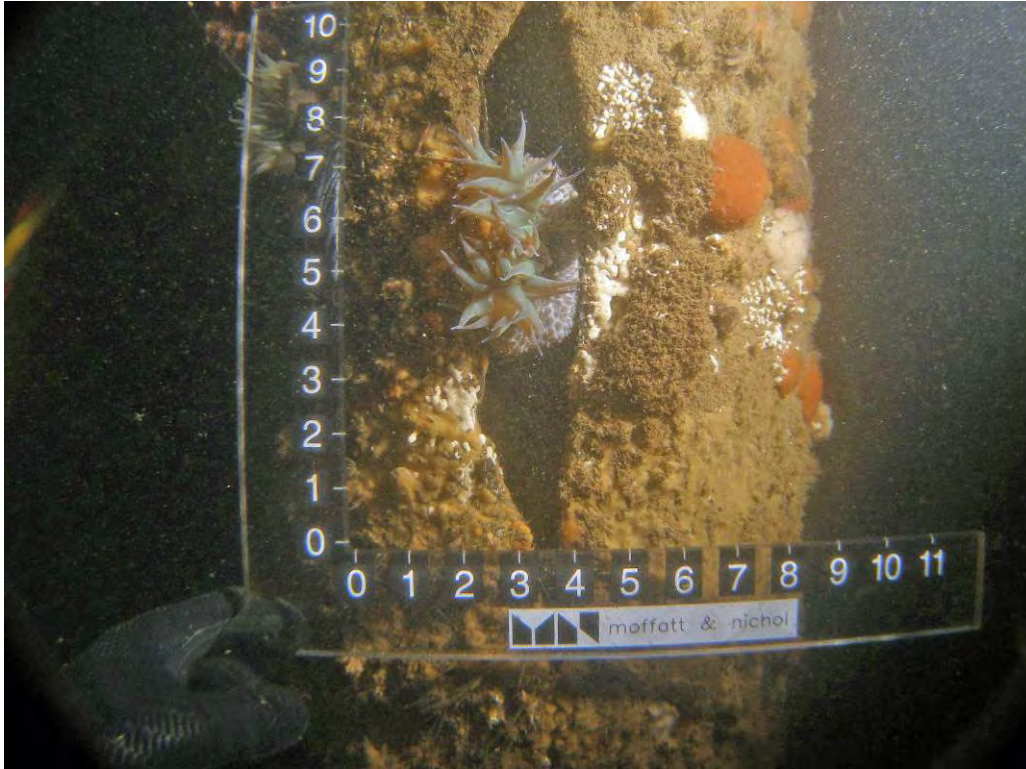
Bent 75, Pile 6 – Crack with 60% section loss inside
